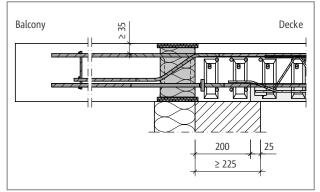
Schöck Isokorb® XT type C: Prefabricated slab without edge support with TICS (section XT type C-L-CV35, view XT type C-R-CV50)
